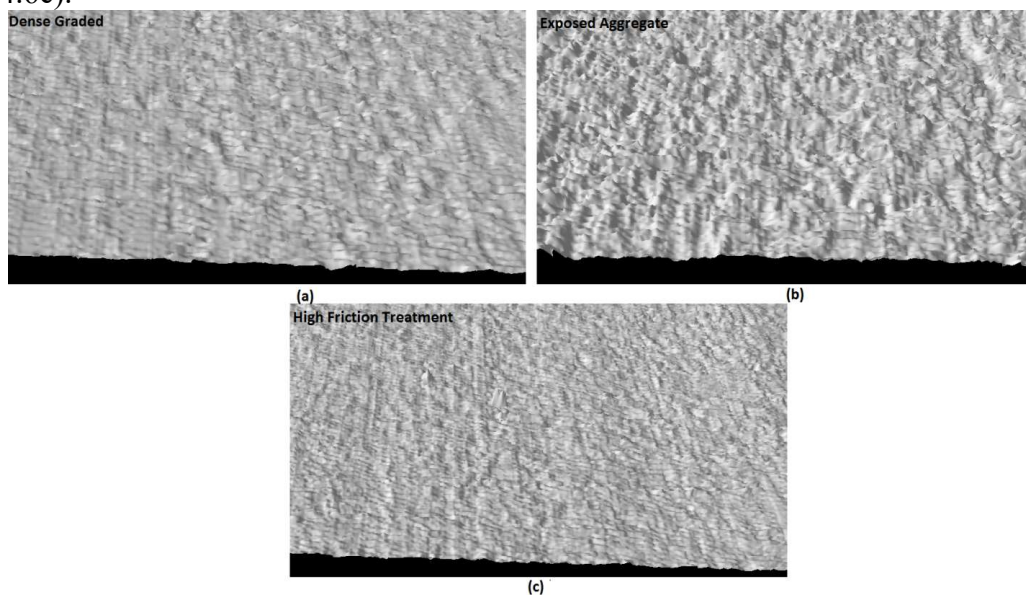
3D rendering of flexible pavement test specimens from 3D Ultra
